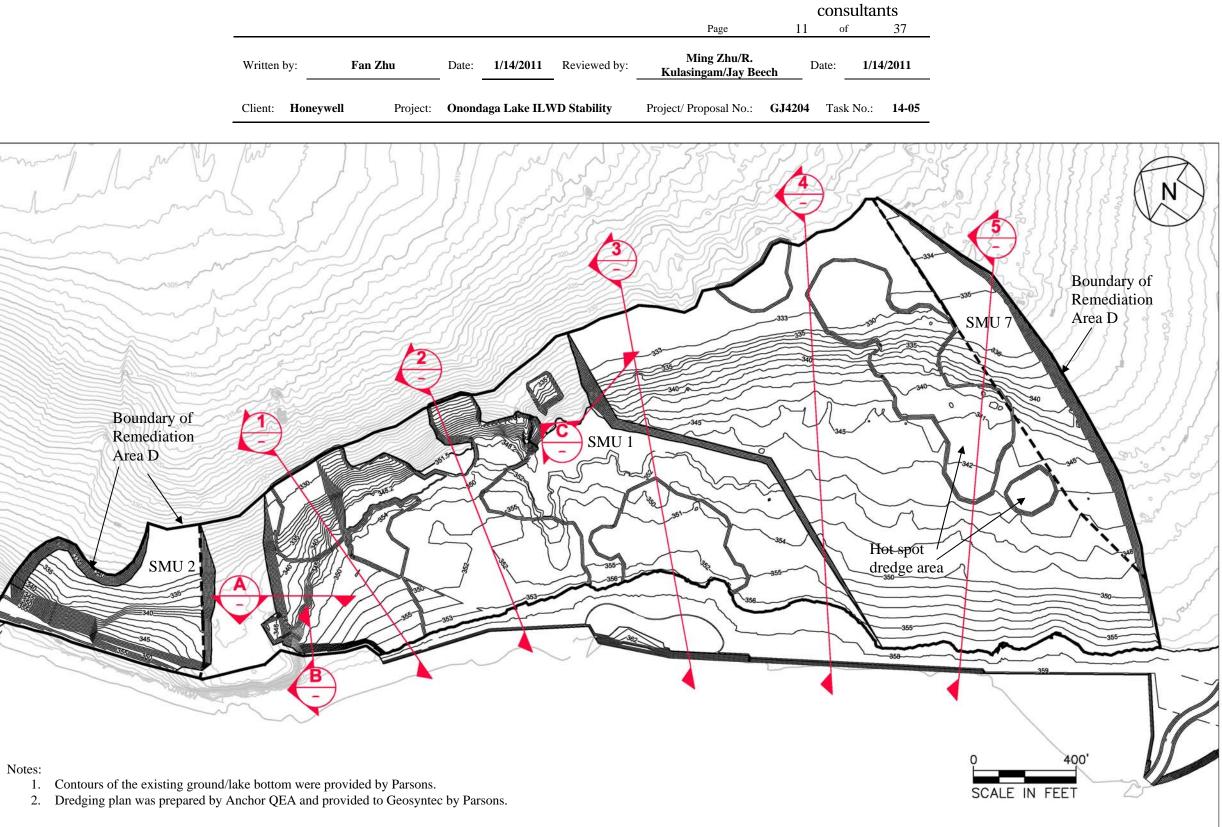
Locations of Selected Cross Sections on Dredging Plan (Dredging plan was prepared by Anchor QEA and provided to Geosyntec by Parsons)
